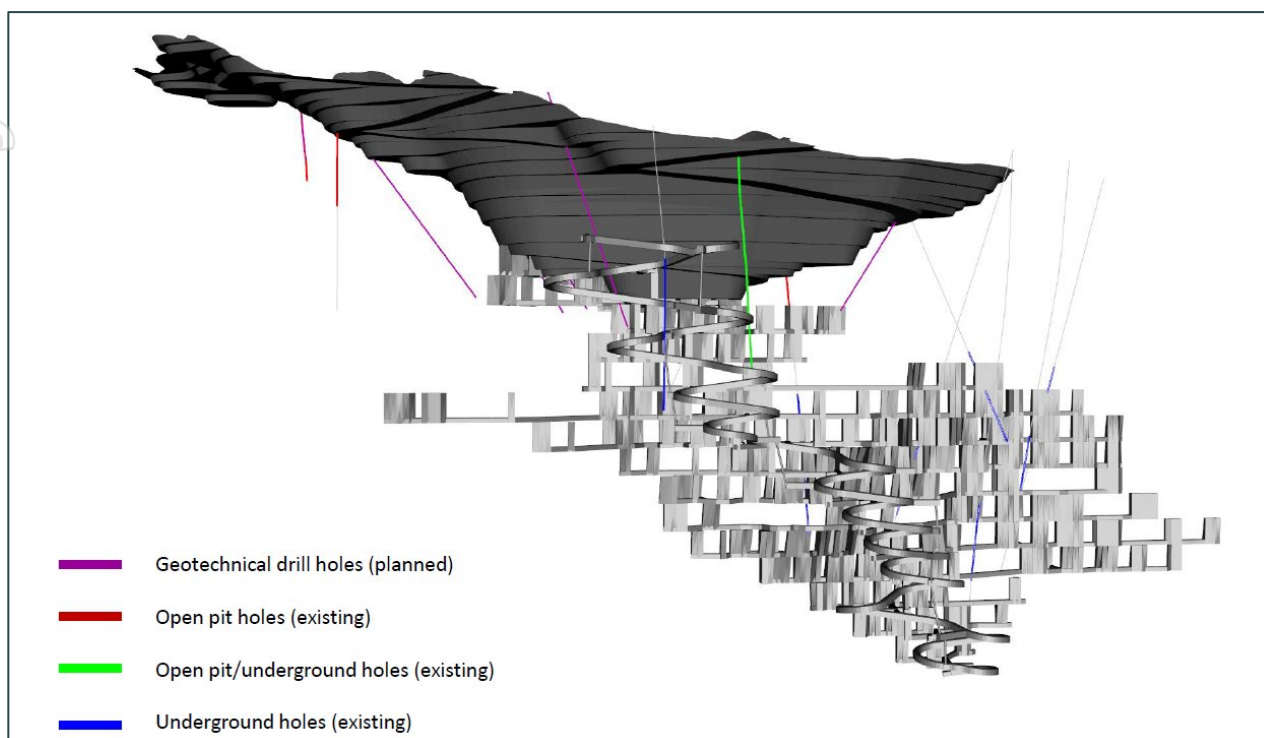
Proposed location of geotech holes for open pit and underground studies, shown against the original scoping study open pit and underground designs.
